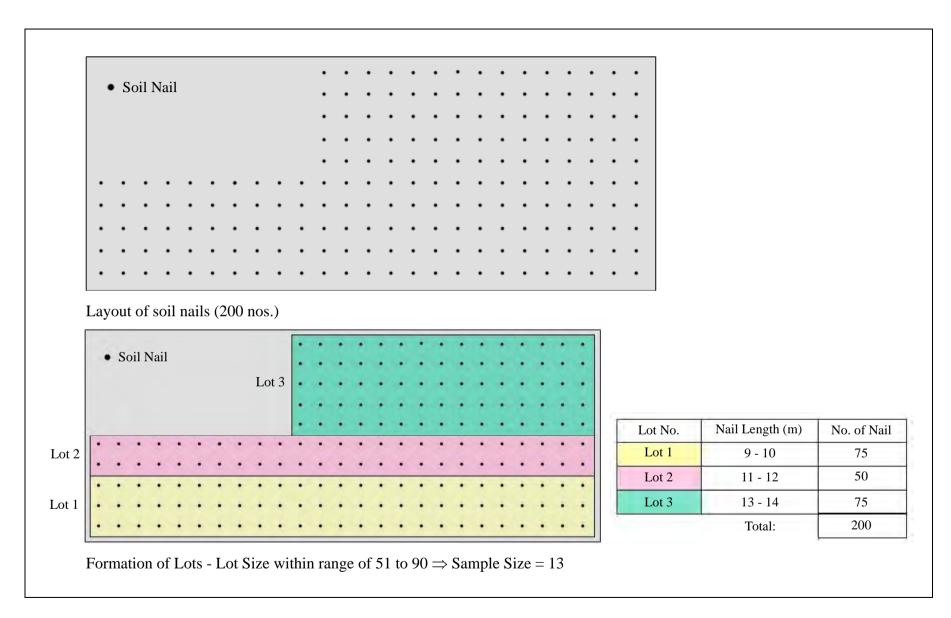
Application of Proposed Sampling and Testing Framework to TDR Testing (Sheet 1 of 4)
